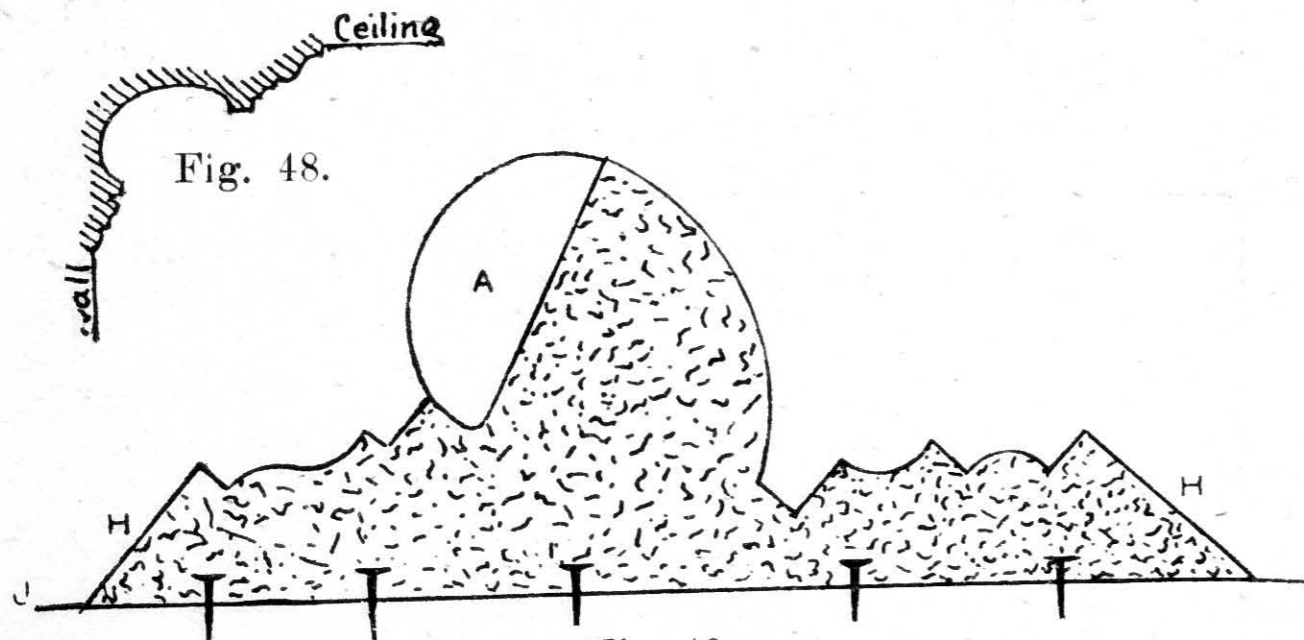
Section of Cornice in Fibrous Plaster. Fig. 49.—Reverse Mould.
